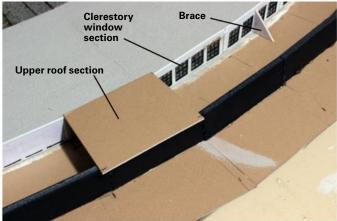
Window installation. Clerestory windows are attached to the lower roof with vertical bracing installed and a section of the upper roof test-fitted.
